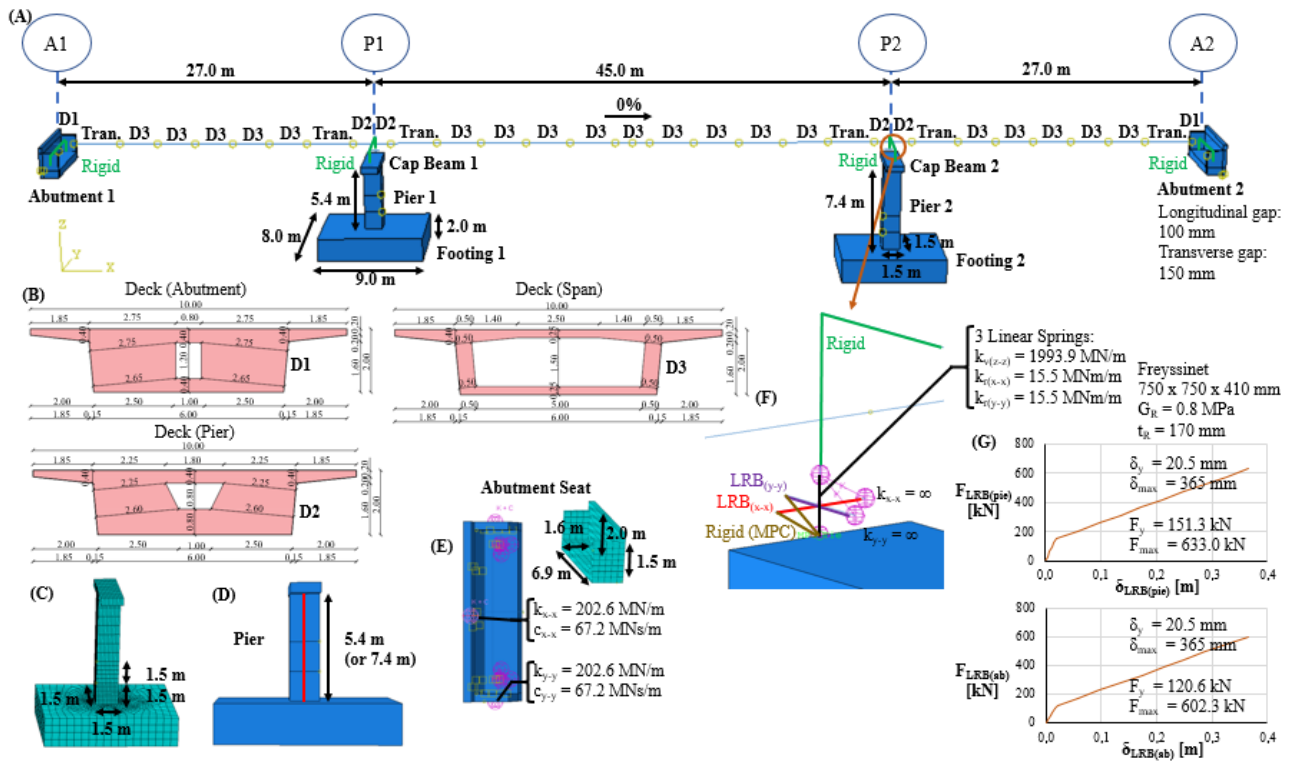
(A) Layout of the conventionally isolated bridge, (B) deck cross-sections, (C) mesh of foundation-pier-cap beam, (D) linear beam element of the piers, (E) layout of the abutment-backfill system, (F) model of the LRBs and (G) bilinear force-displacement behaviour of the LRBs located at the piers and abutments.
